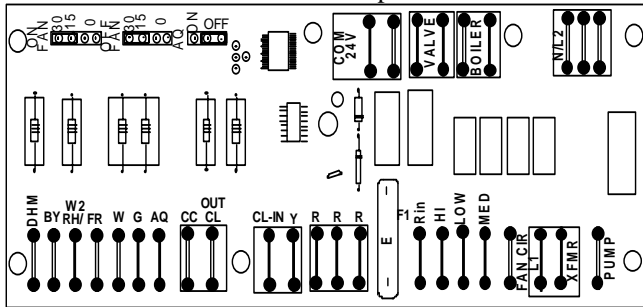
AY1015 Hydronic Control Board for Constant Torque Blower Motors
